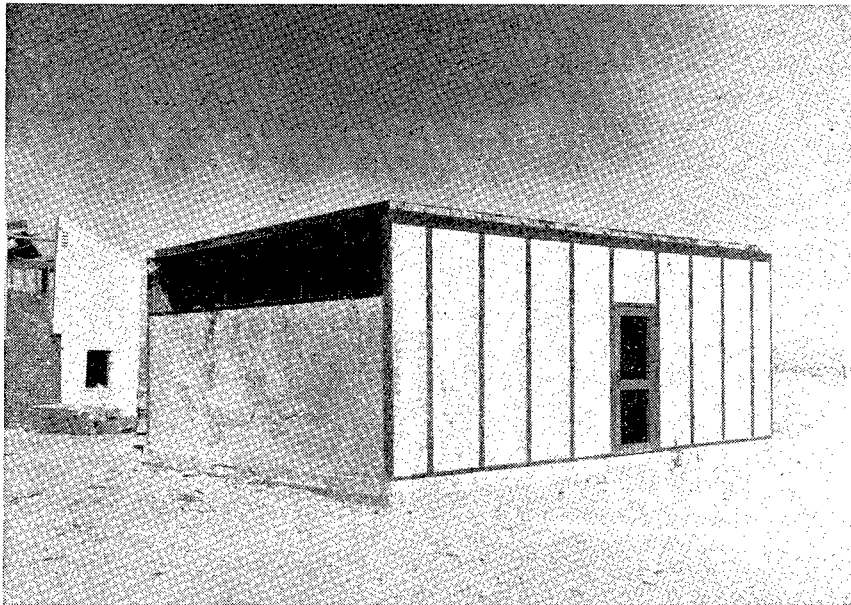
Union Carbide Building (After)—Comparison with figure 8 shows how little damage this prototype sustained. The plastic windows and the door were not designed to resist blast. Visual inspection showed small deformations of the steel frame but no primary structural damage.
